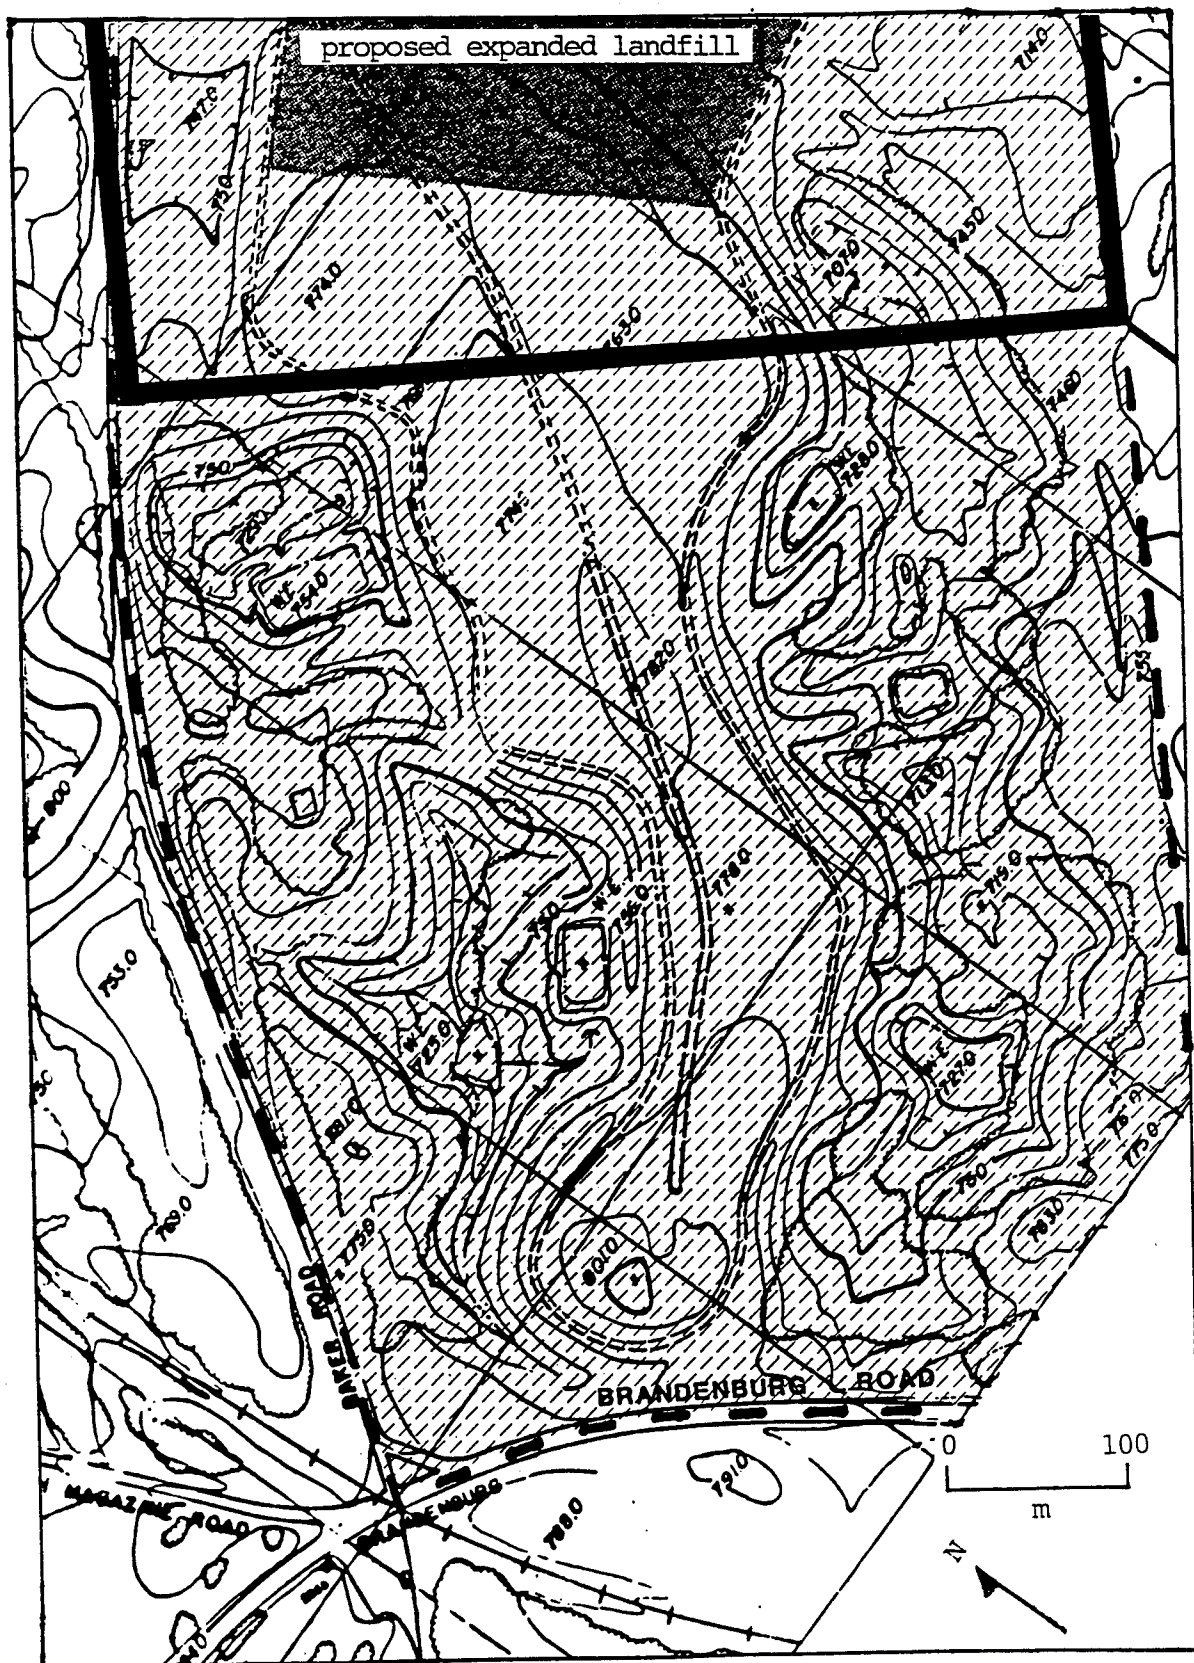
Plan View of Southwest Half of Landfill and Borrow Tract.
